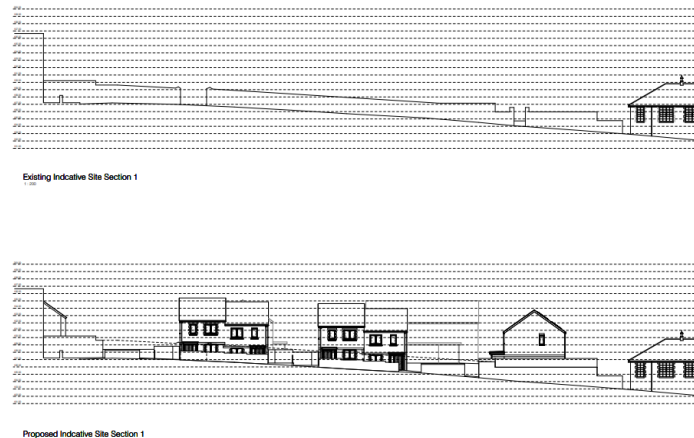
Site Sections fronting Grosvenor Terrace – Existing and Proposed
